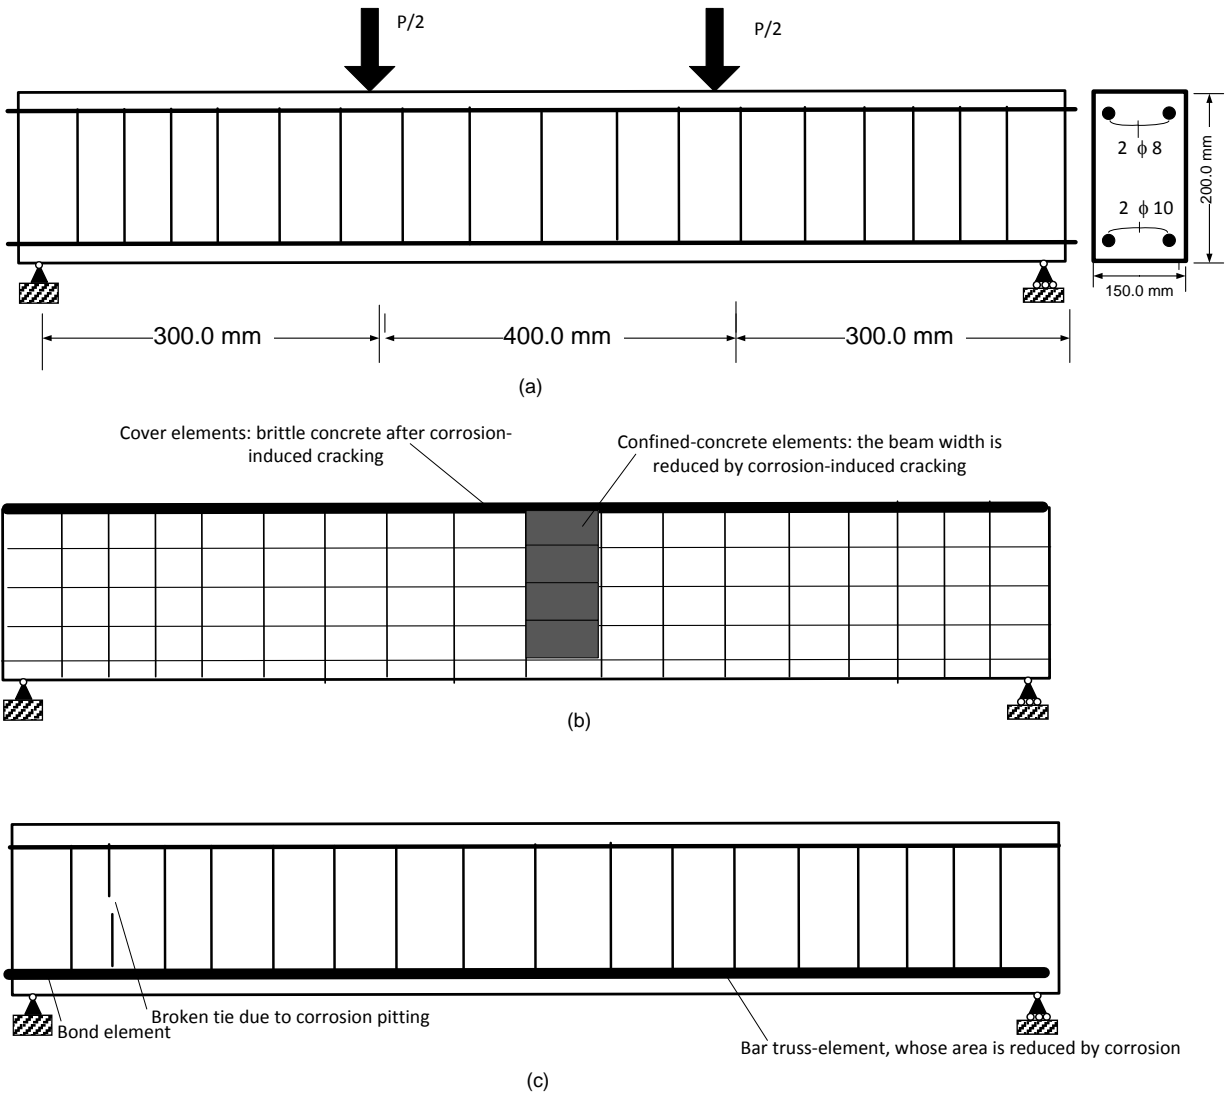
a: Case study III: simply-supported beam under points load and corrosion (Coronelli & Gambarova 2004); (a) reinforced concrete beam geometry and reinforcement ;(b &c) finite element of a reinforced concrete beam taking into account the mechanical effects of corrosion.
